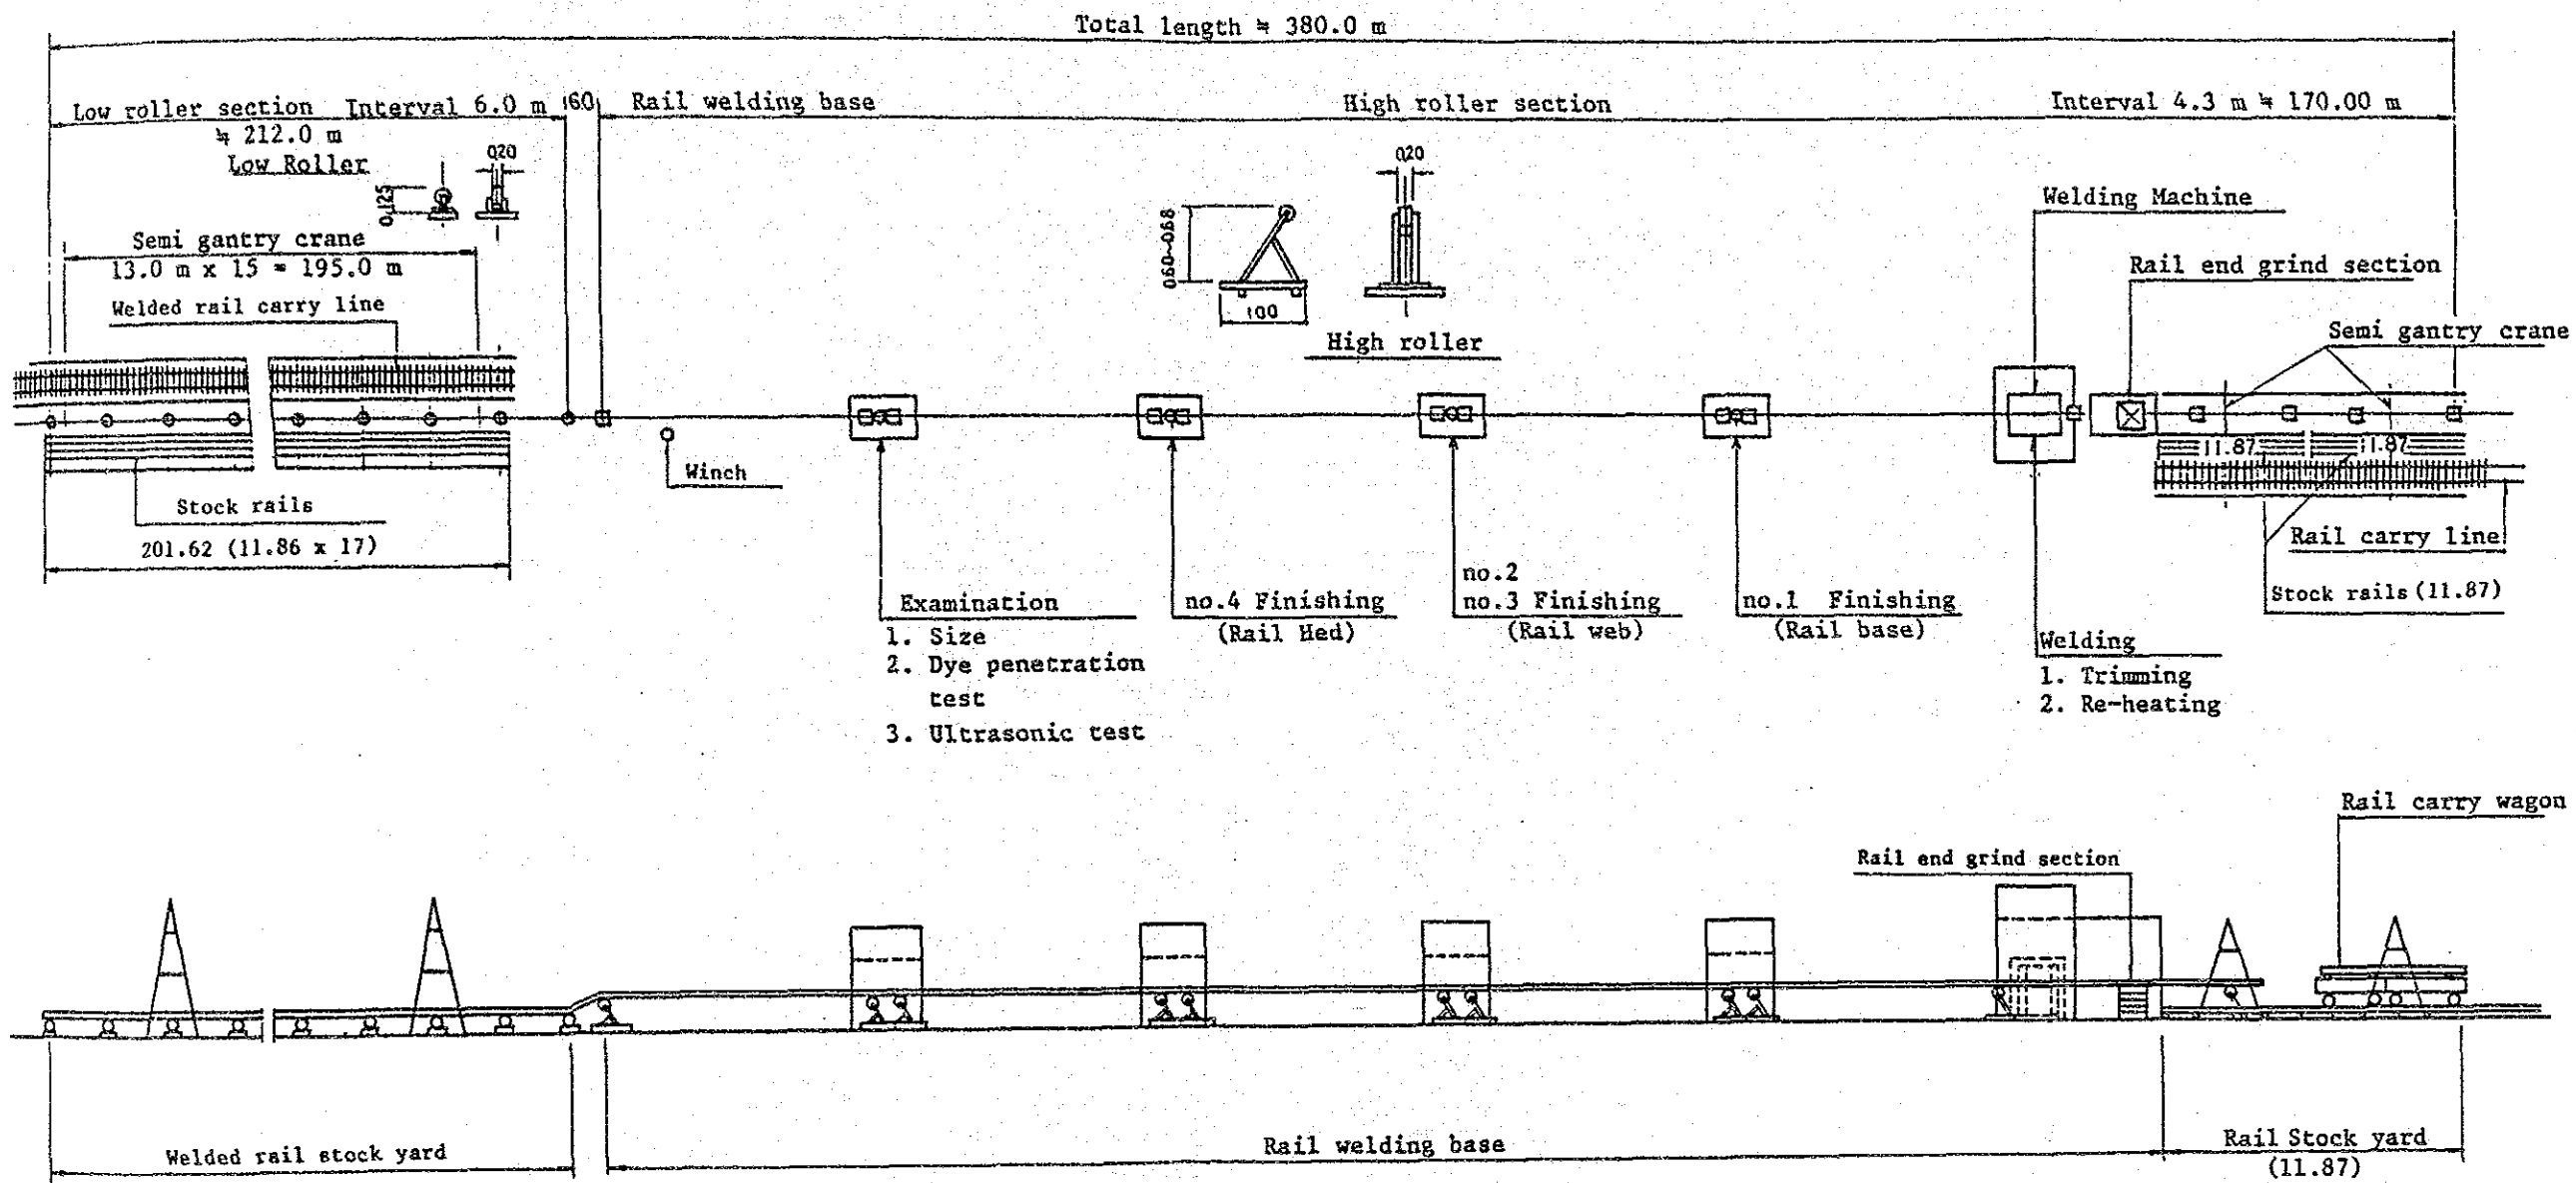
Typical Rail Welding Workshop
